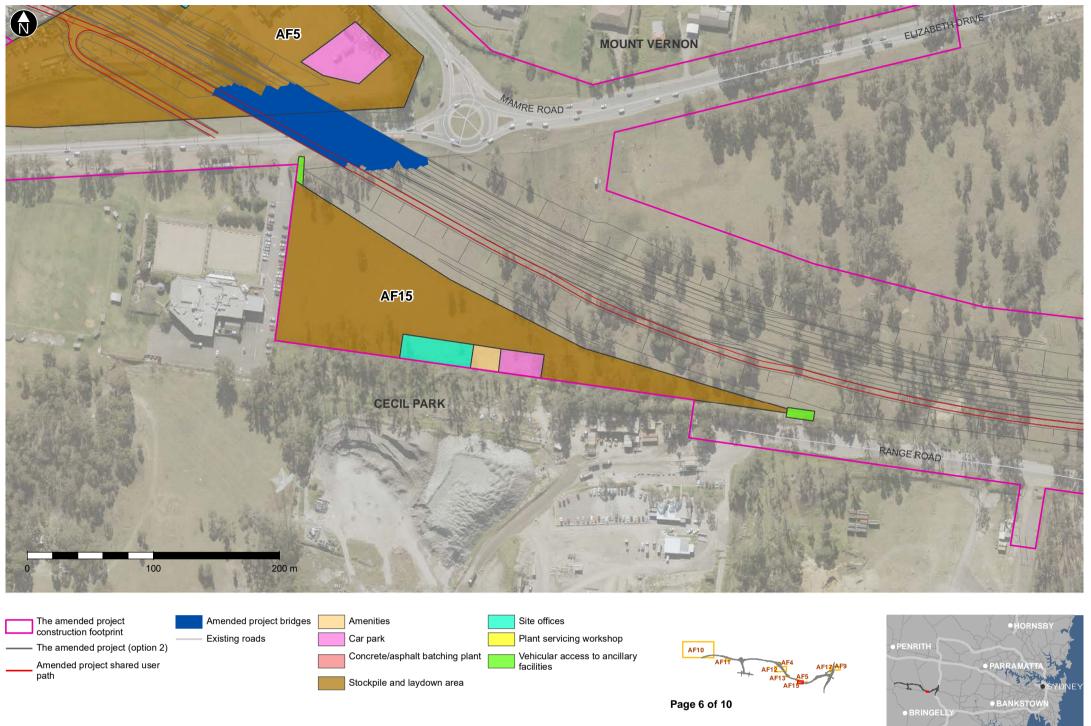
Access points for the additional and amended construction ancillary facilities
